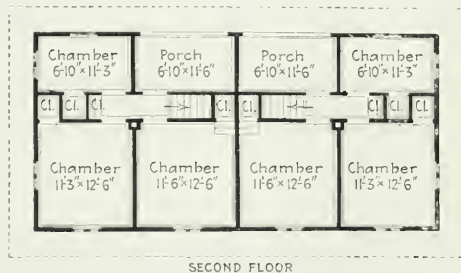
PLANS OF THE DOUBLE SIX-ROOM DWELLINGS AT CONCRETE CITY
